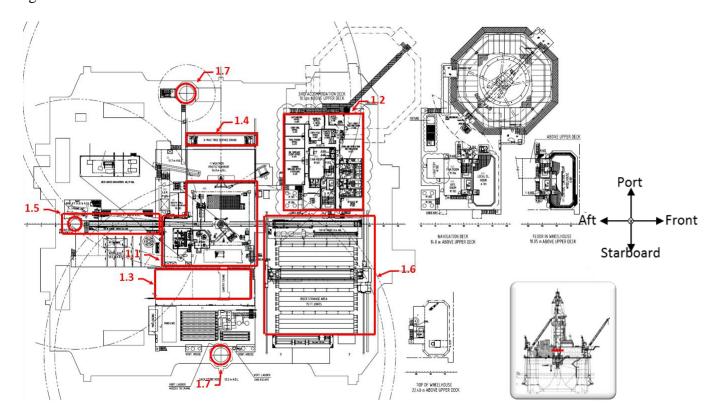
KEY AREAS OF THE DRIL FLOOR LEVEL LAYOUT.
